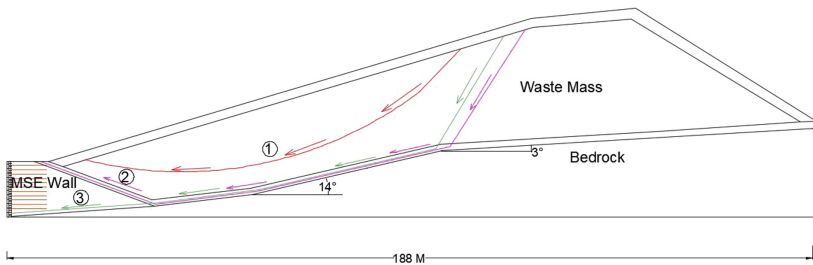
Modes of failure for an engineered HW landfill on the sloping ground MSE wall at the toe.
